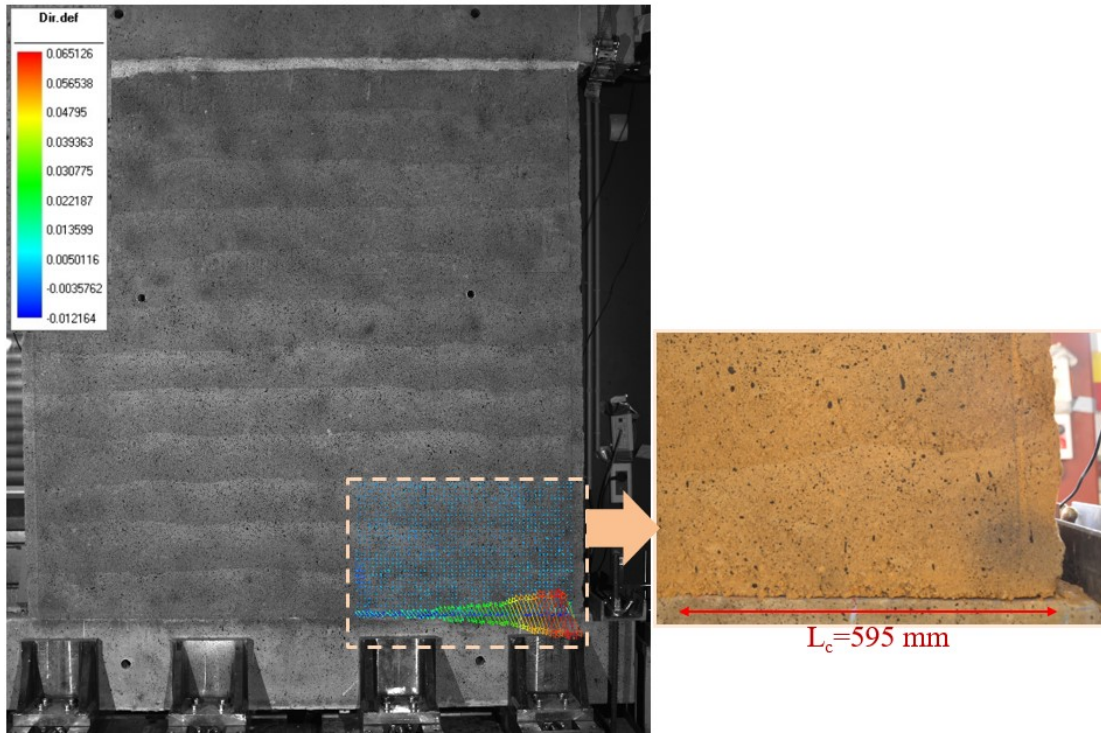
Rocking at the base of wall 3 for 2 (corresponding to 36 kN horizontal loading)
